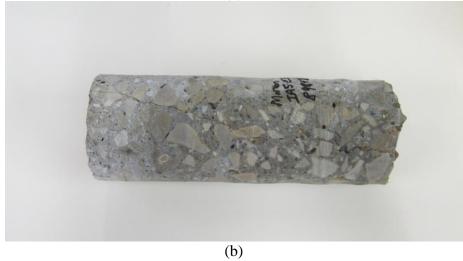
Concrete core from LC Site 3 – IA 163 in Mahaska County
